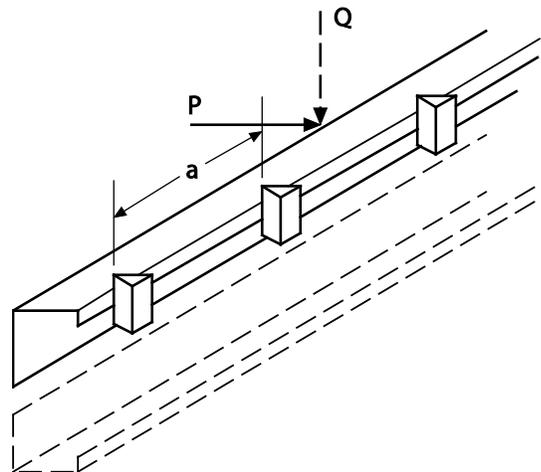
Half of C-Section Treated as a Continuous Beam Loaded by Horizontal Forces
